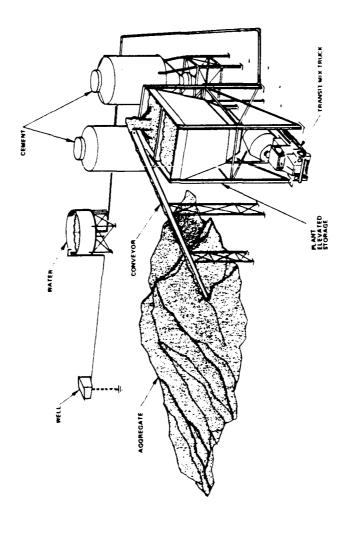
Conventional cast-in-place concrete plant.
